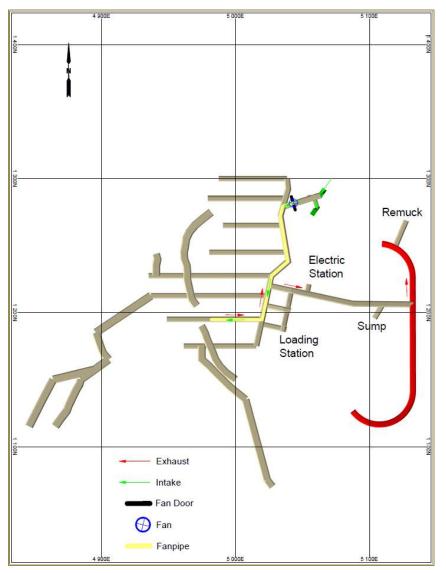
Ventilation on a Typical Level in the Marc Zone
